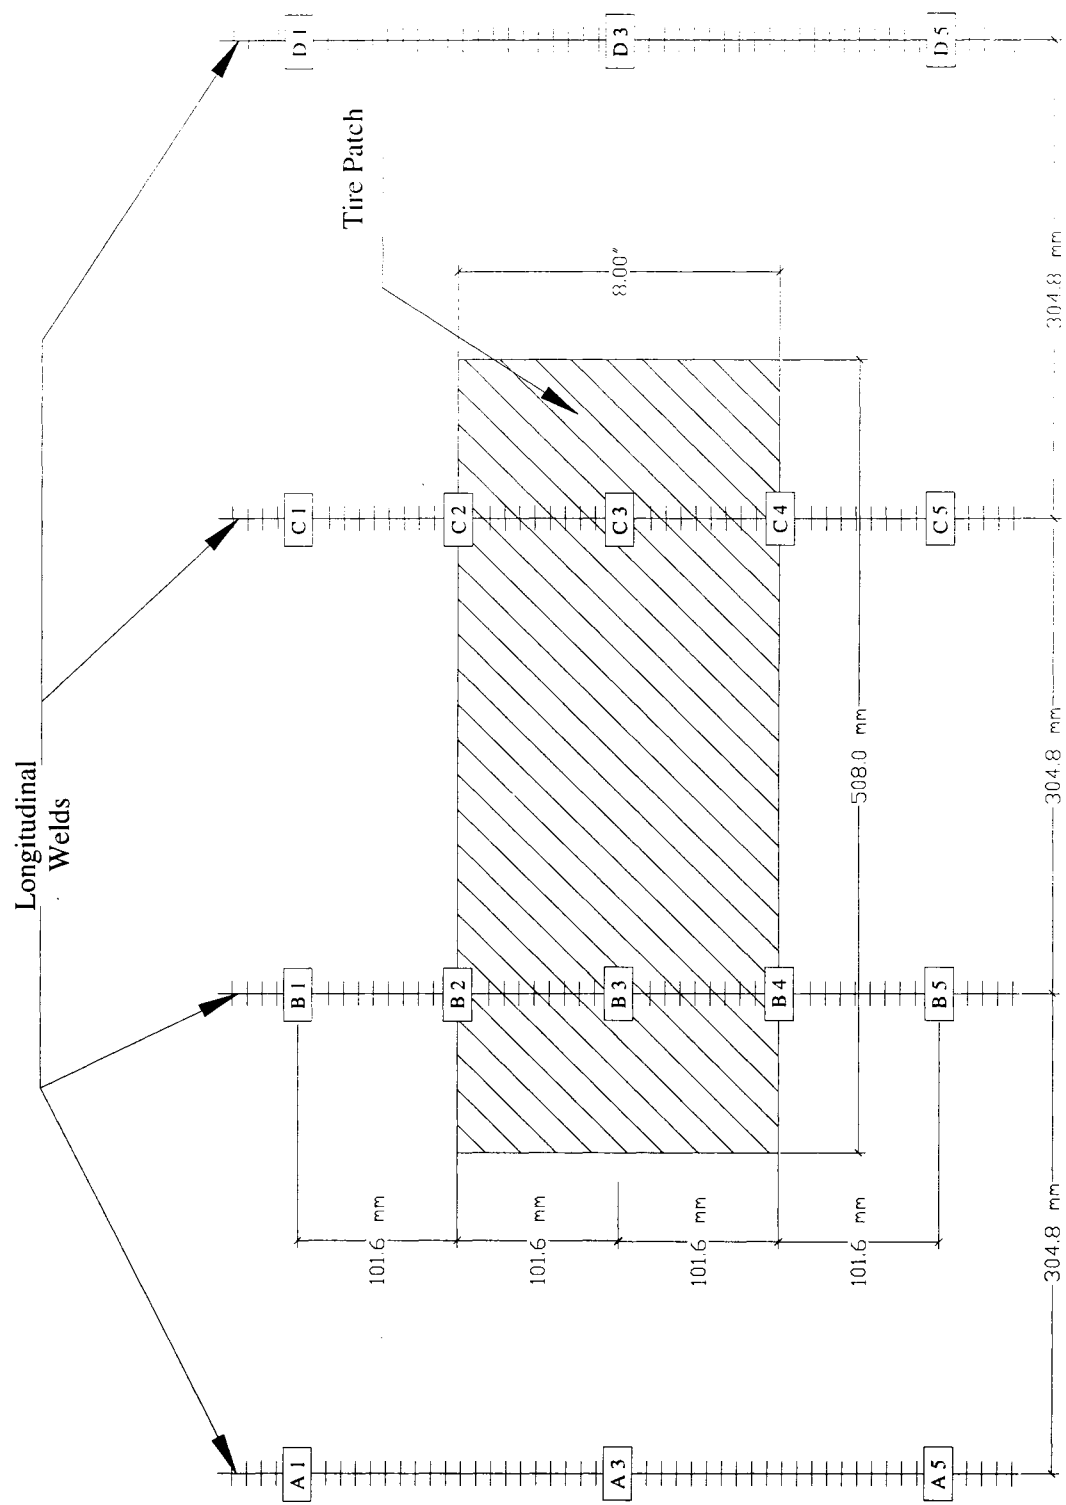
Fatigue Test 2 Gage Layout, Bottom of Side B
